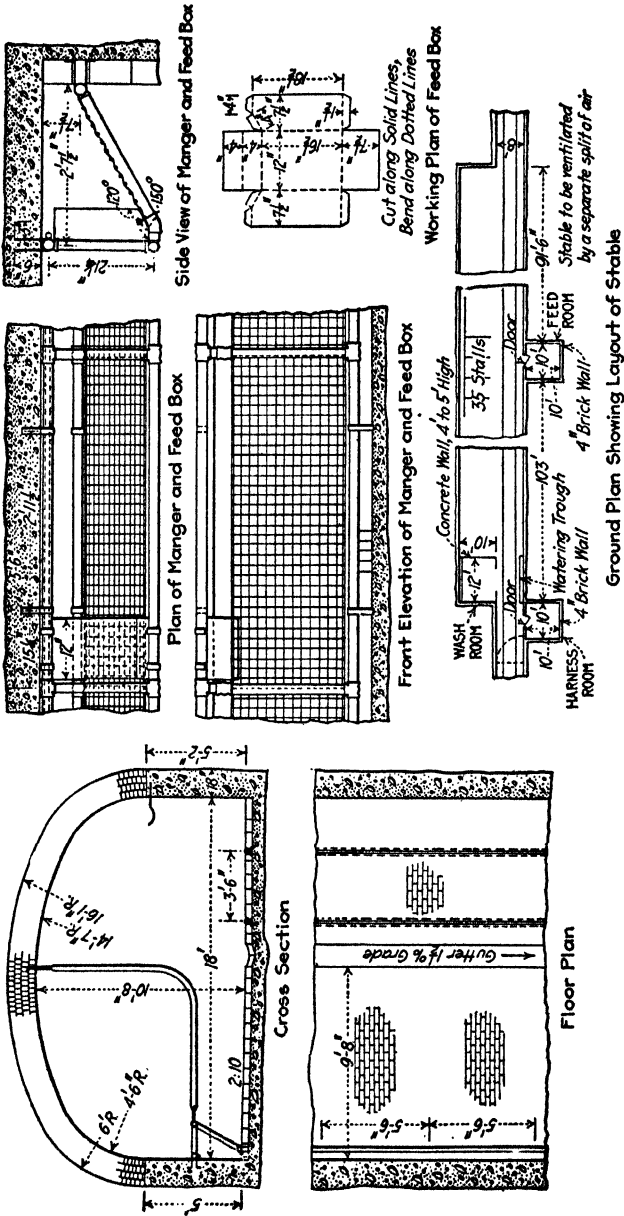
Plan, elevation and section of an economical type of concrete, brick and steel mine stable.
